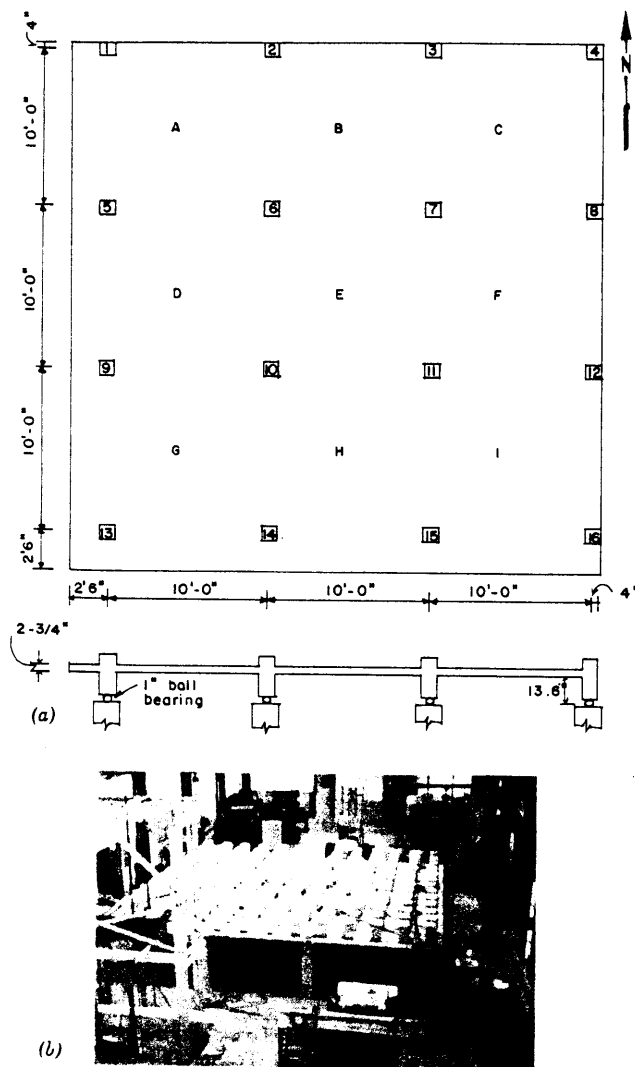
Test Slab: (a) Plan and Elevation (1 ft = 0.305 m; 1 in. = 25.4 mm); (b) Test Slab with Concrete Blocks
